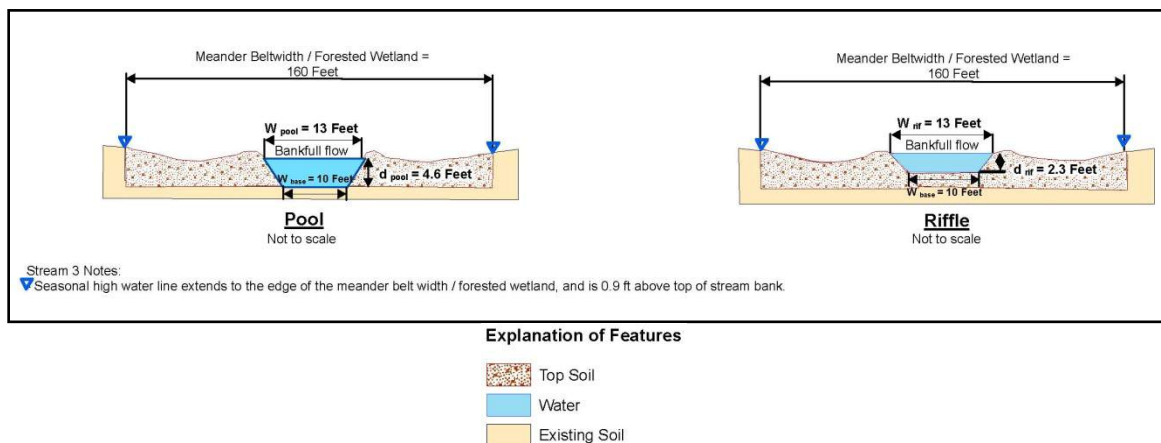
Example of Channel and Floodscape Cross-Section Schematic.
